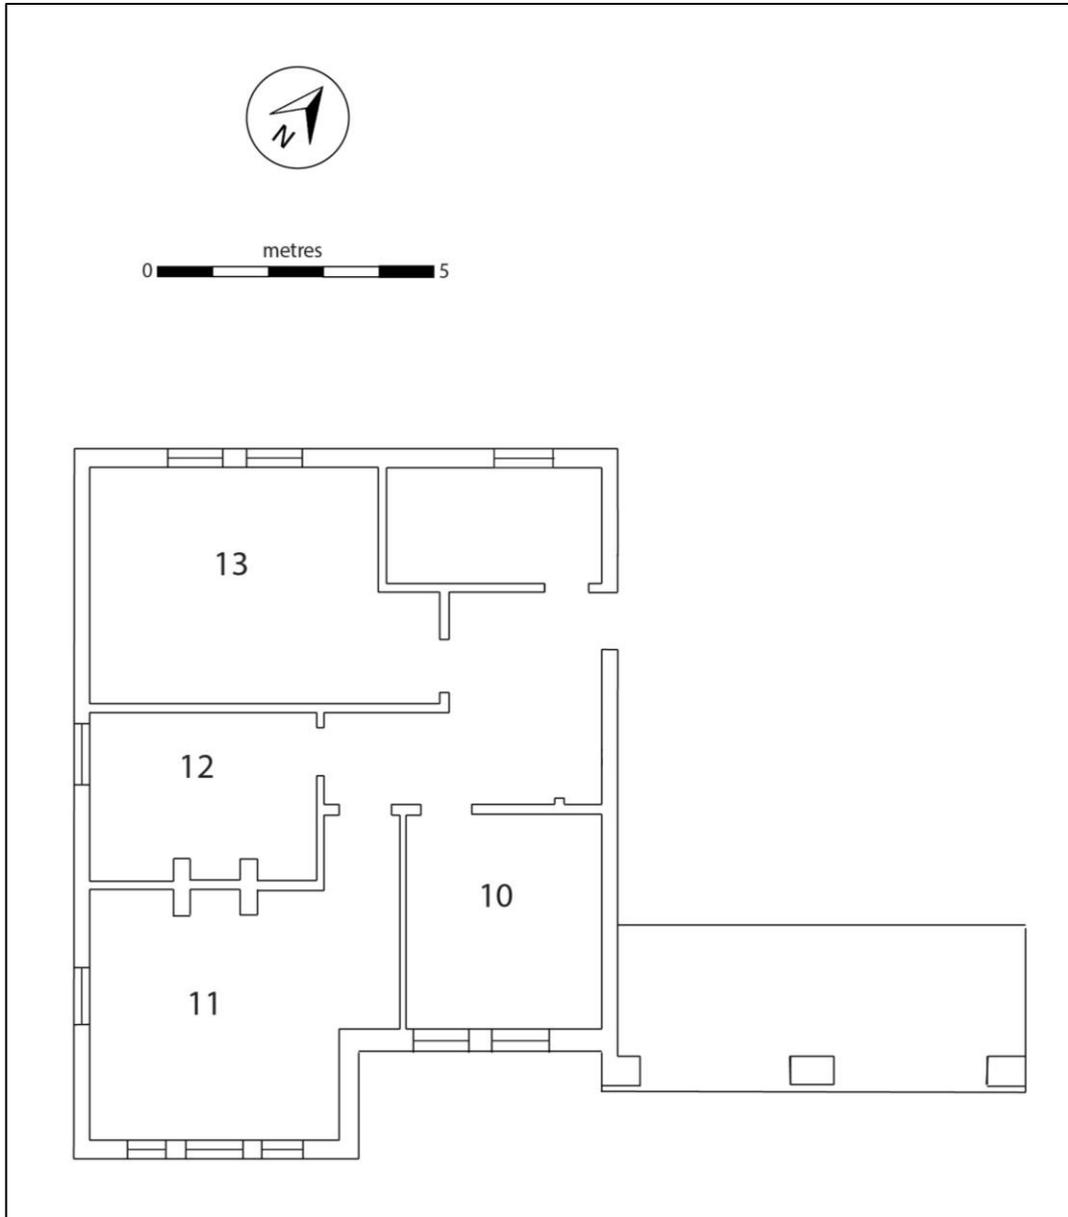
Floorplan of the Phase 2 addition. For location refer back to Figure 4-1.
